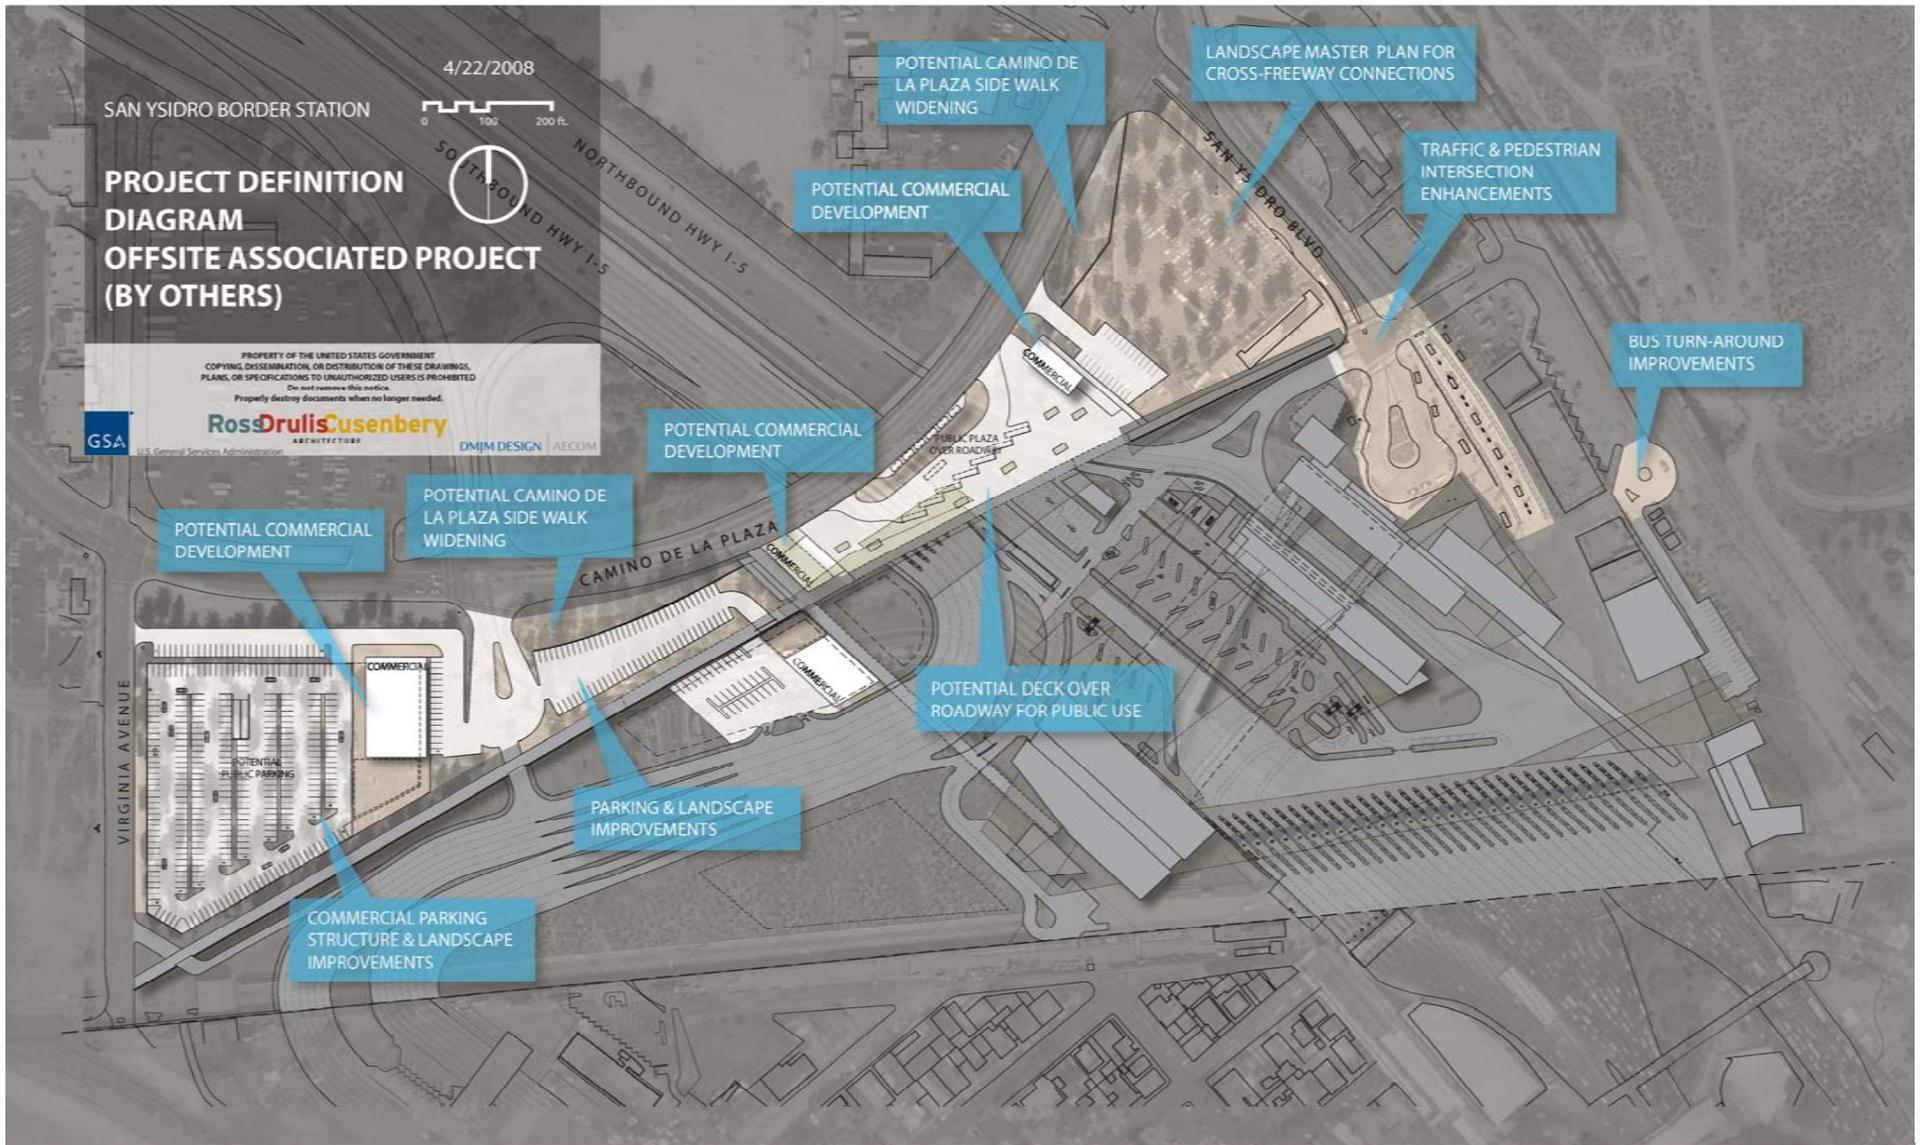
Potential commercial development, not part of San Ysidro POE expansion project
